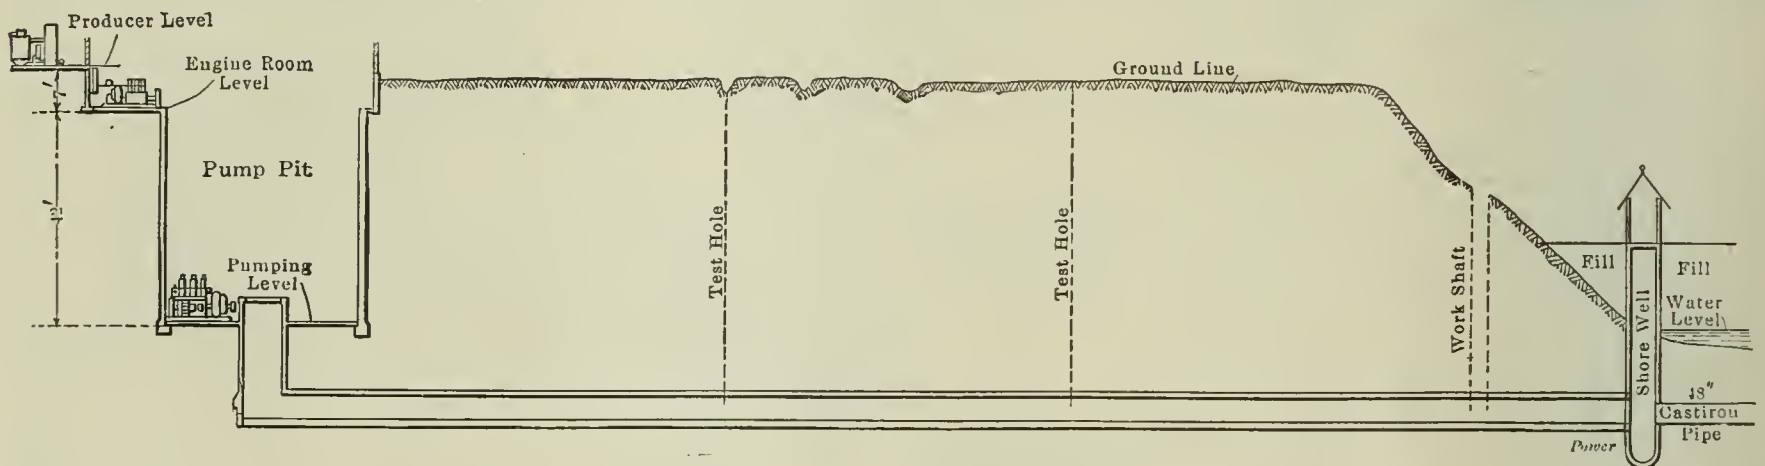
SECTIONAL ELEVATION OF PUMP PIT AND PROFILE OF PIPE ROUTE
